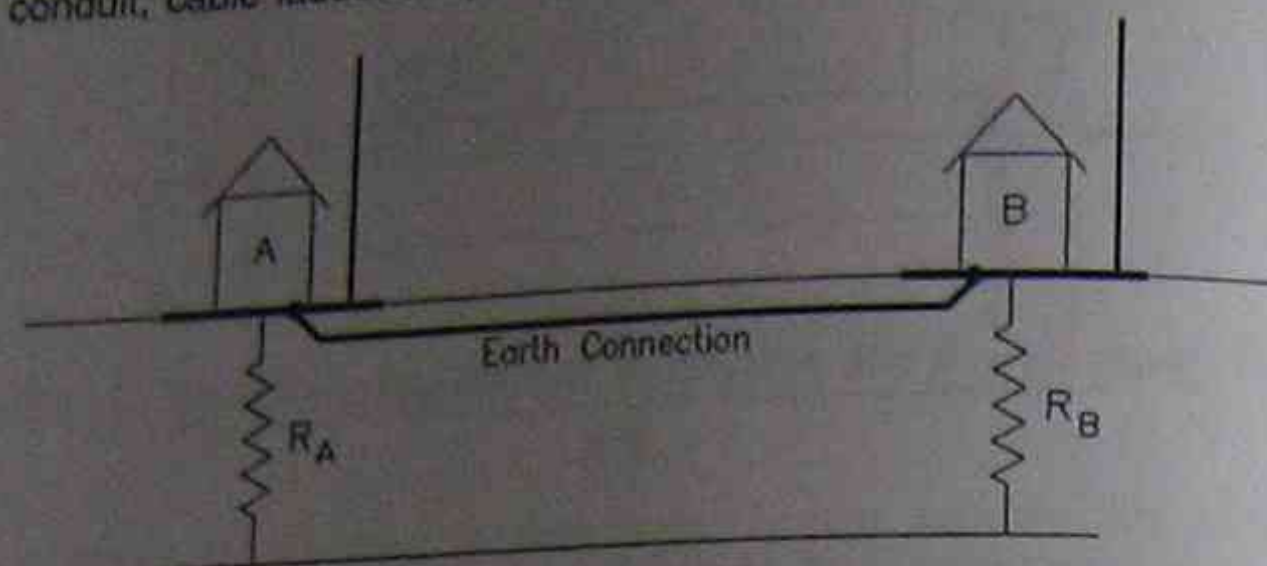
The Earth Interconnection between Two Buildings or Structures
